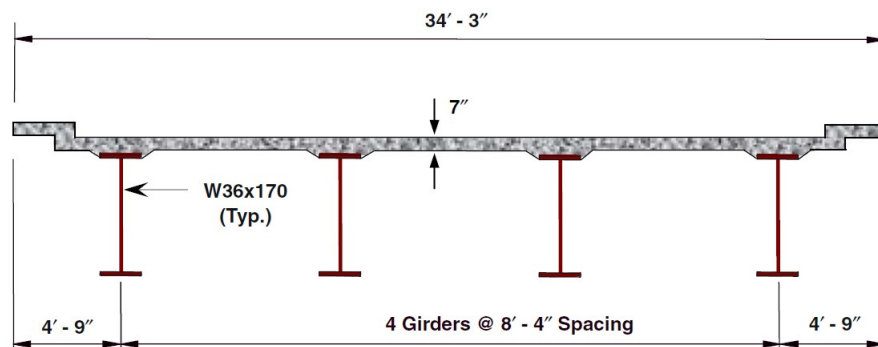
Cross section of Tennessee 4-span continuous bridge
